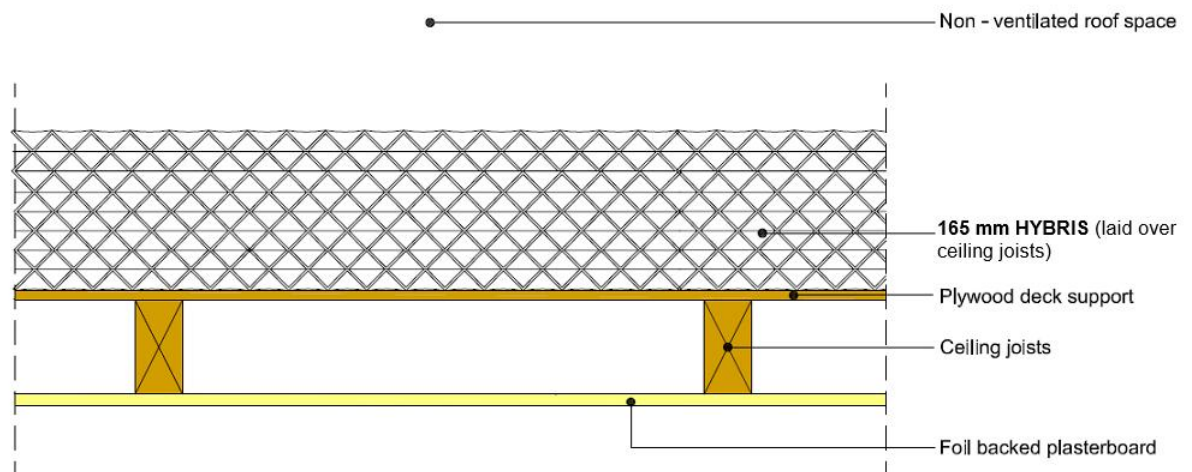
Typical HYBRIS installation in lofts in one layer over ceiling joists.
